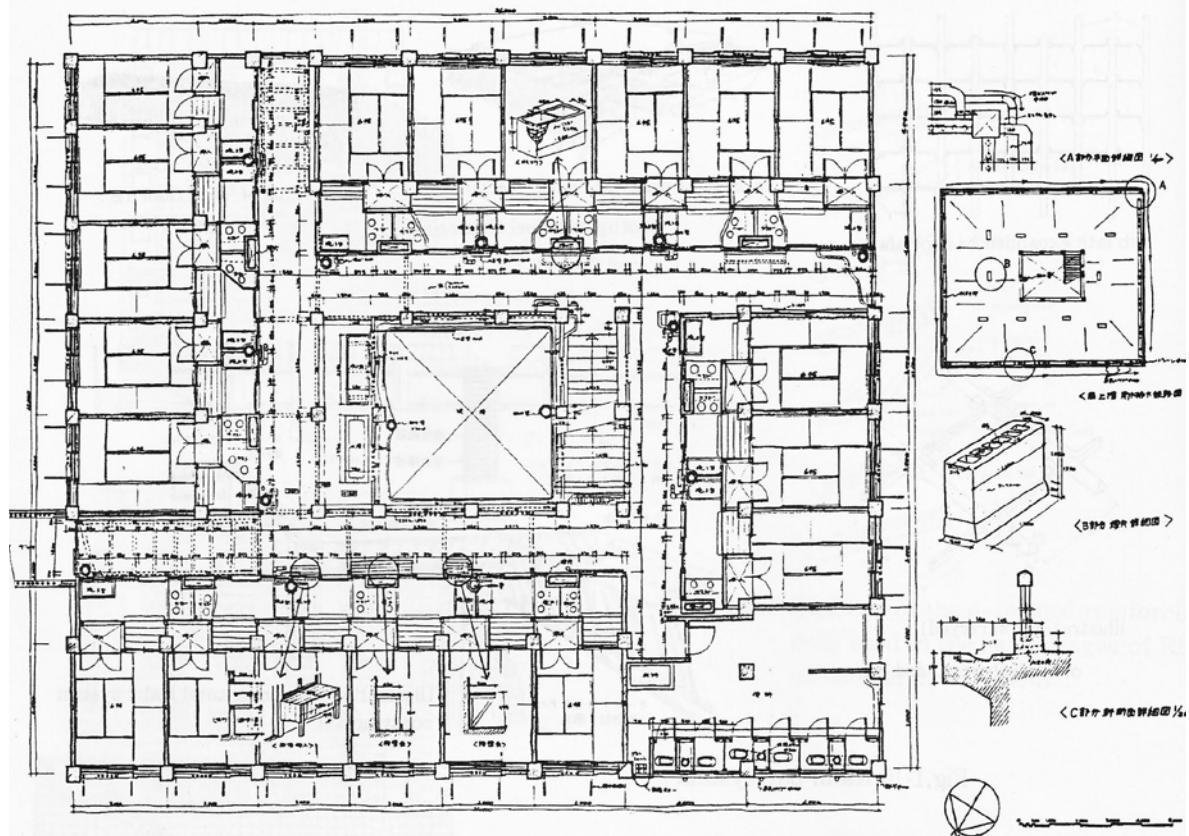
Fifth floor plan (surveyed) of building No.30. 1/200. Building No.30 is the oldest reinforced concrete flats in Japan. Erected in 1916, of unique hooked cross planning.
